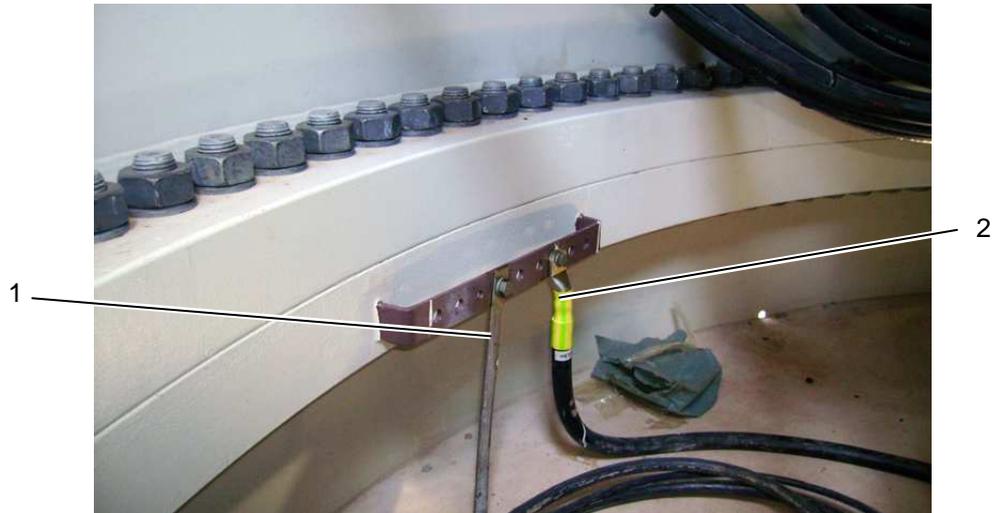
1 Foundation and tower grounding connection
